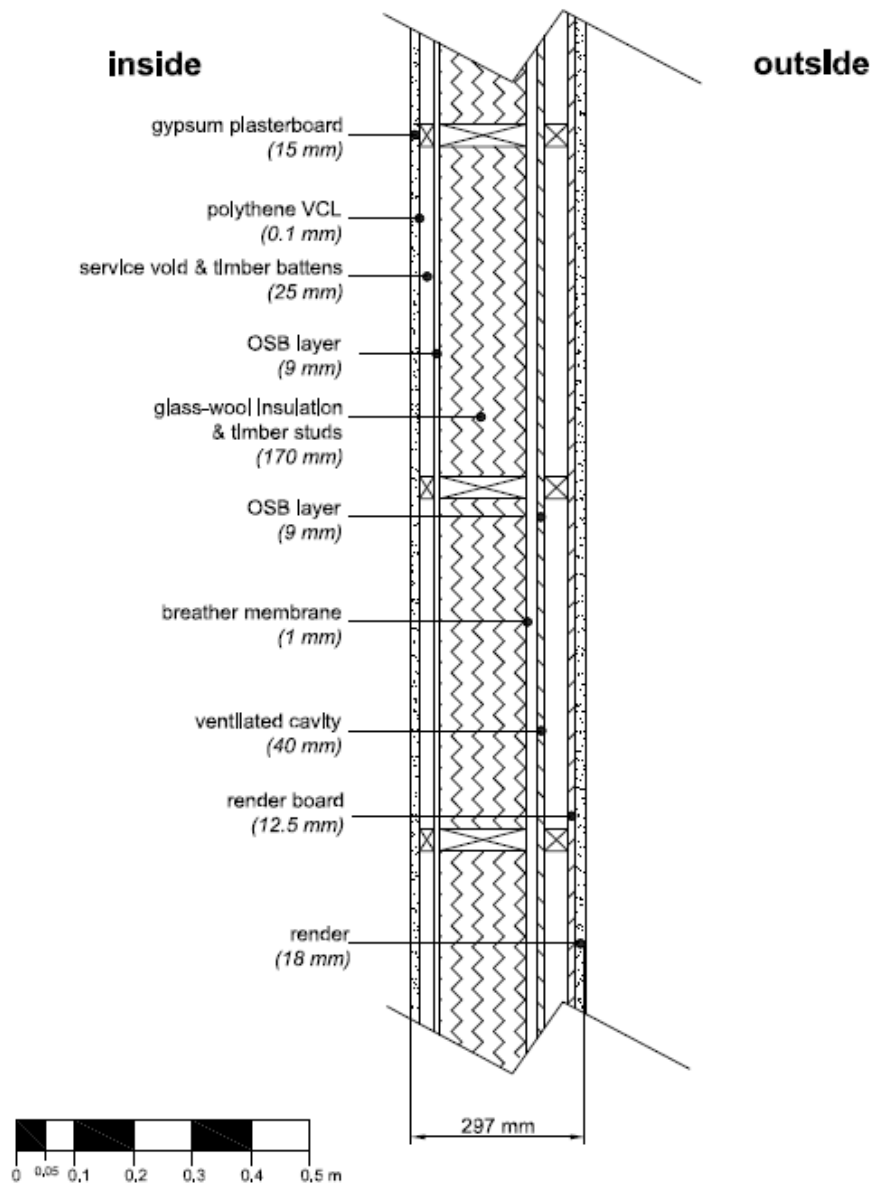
Wall B2 (closed-panel timber frame, external solution: render on boards), horizontal section.
